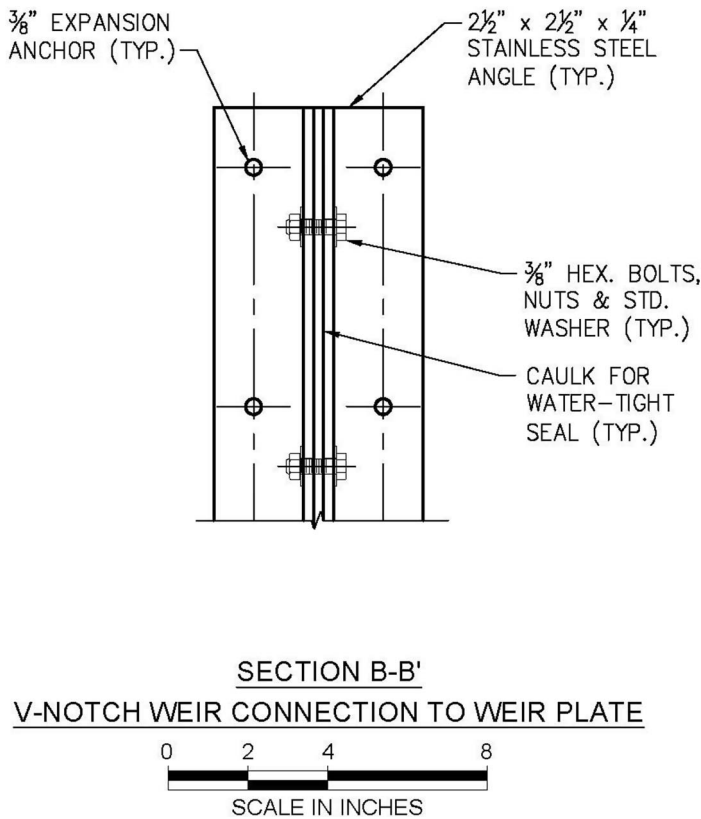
P-11. Section B-B' V-Notch Connection to Weir Plate, before Dimensioning
